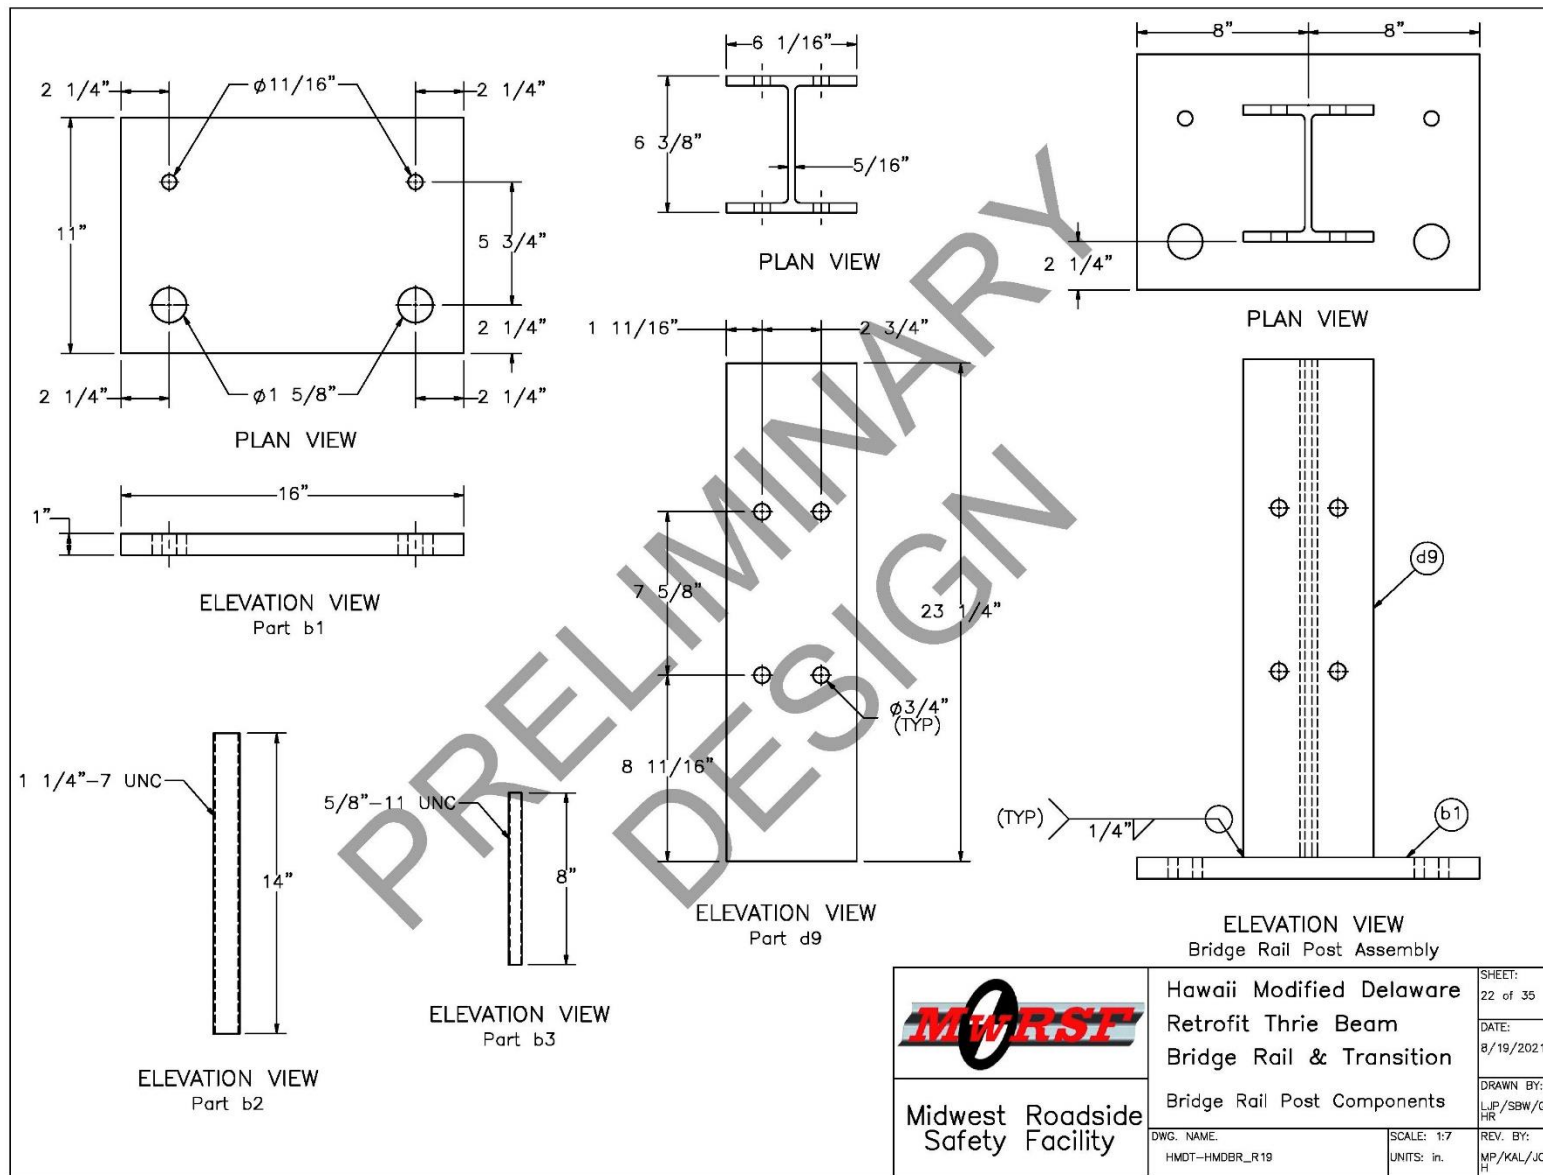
Bridge Rail Post Components, Test No. HMDT-1
